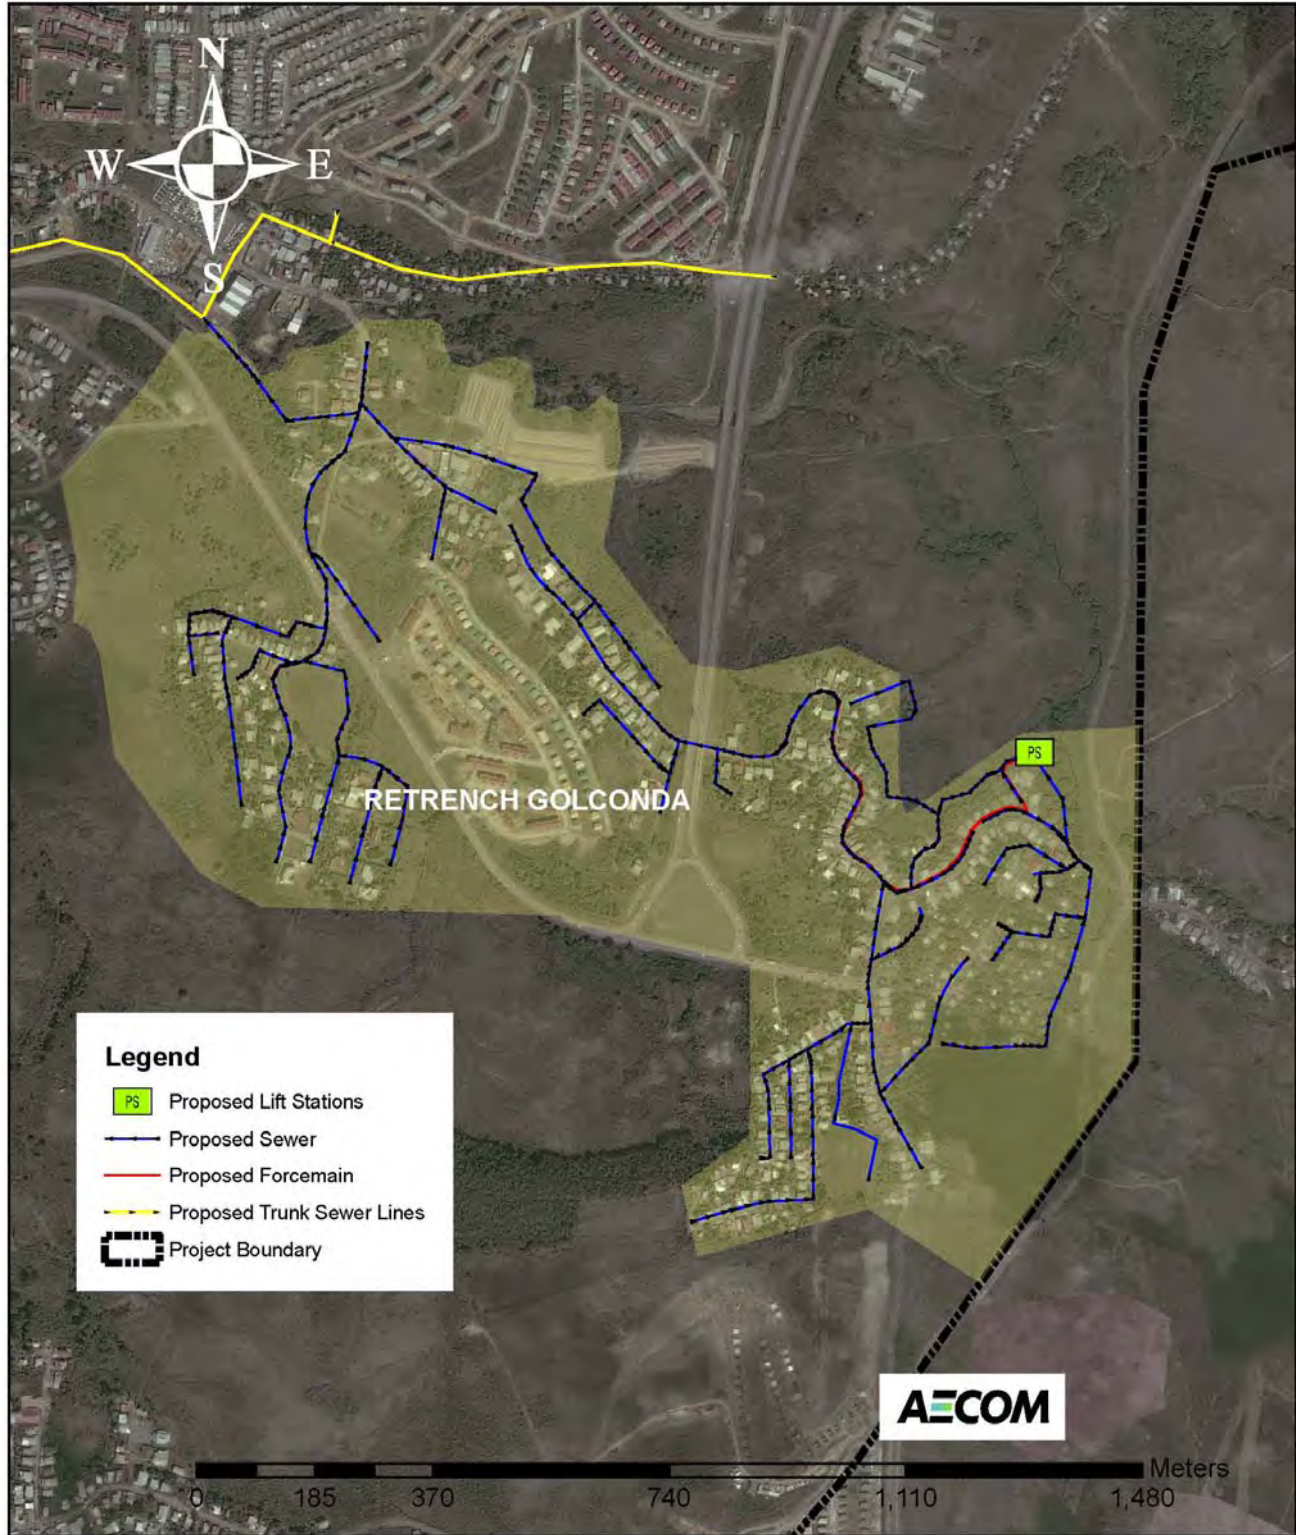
Retrench Golconda Subcatchment New Sewer Layout
